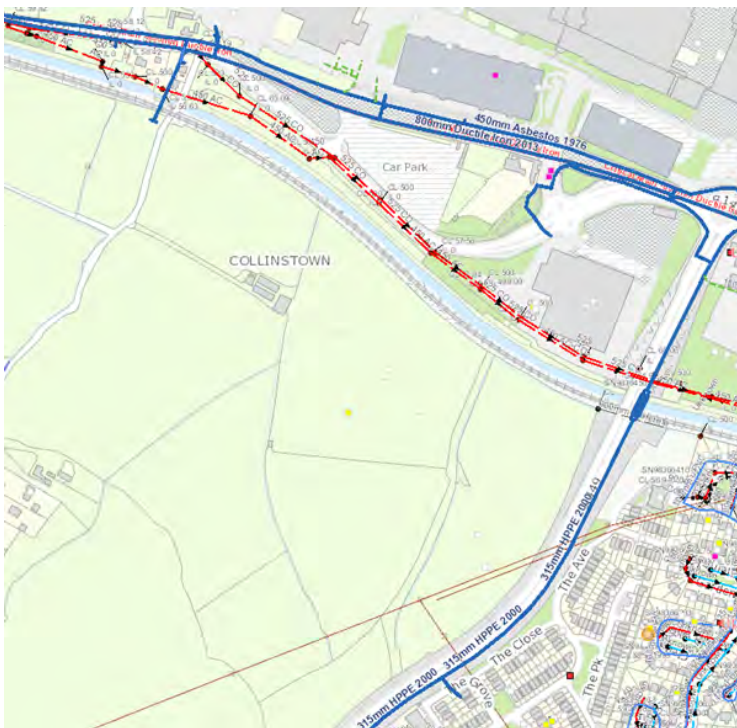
Water and Wastewater Infrastructure Map – Collinstown.
